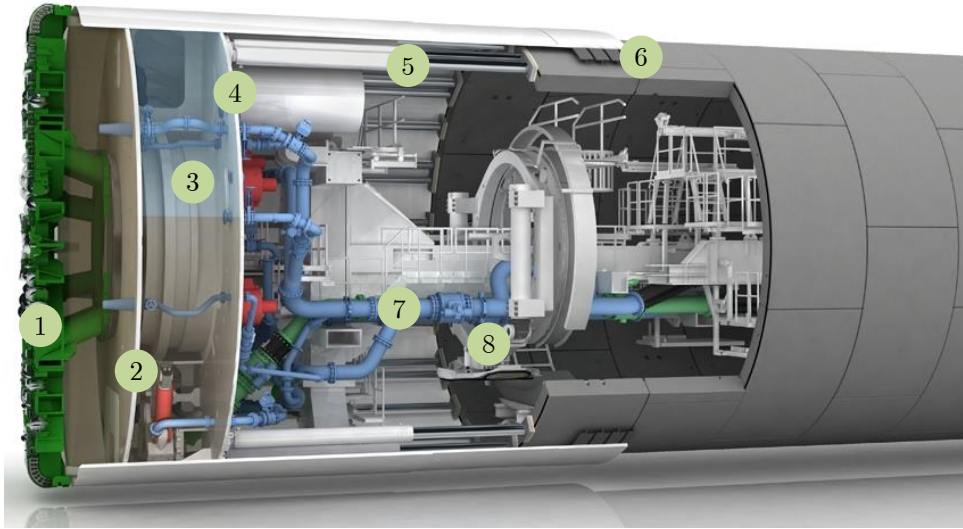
Illustration of a typical slurry shield tunnel boring machine: (1) cutting wheel, (2) submerged wall, (3) air cushion, (4) bulkhead, (5) thrust cylinders, (6) tail void grouting, (7) slurry circuit, (8) erector (Source: Herrenknecht AG)
